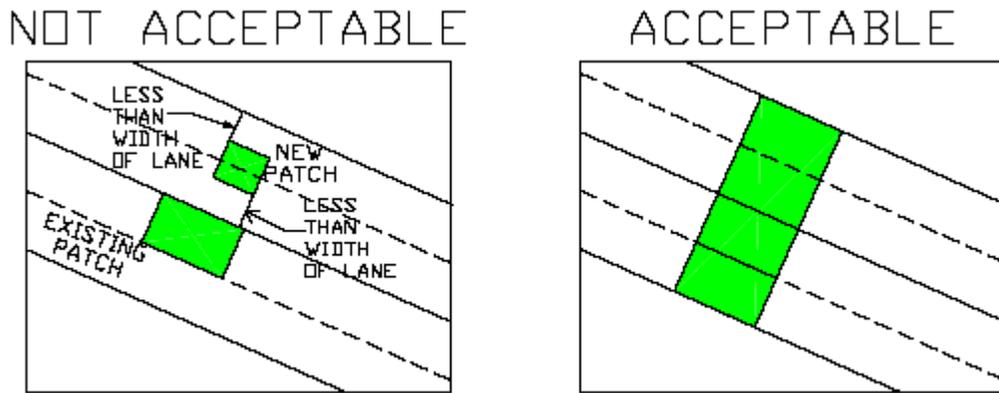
Example 3: Do not leave strips of pavement less than one-half lane in width.
